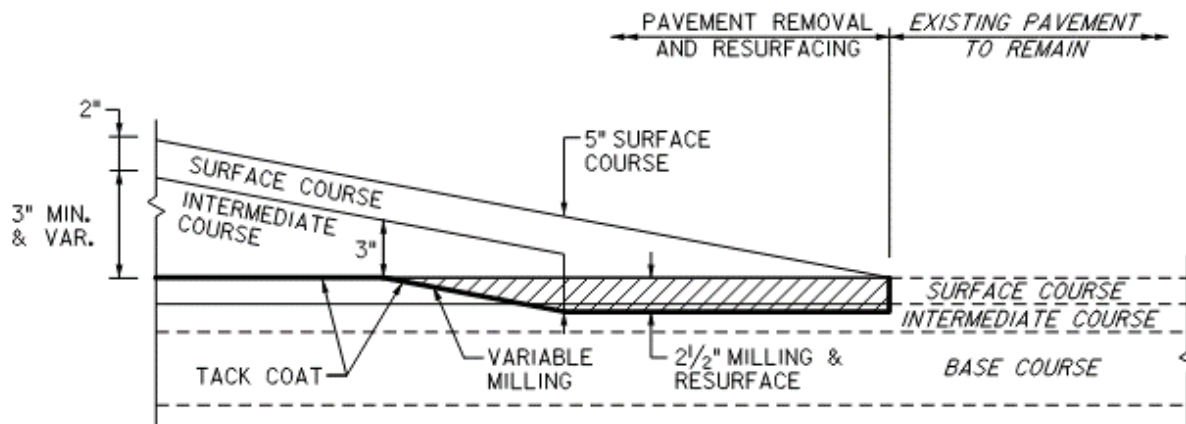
Parkway Pavement Section (Mainline, Ramps, Shoulders, U-Turn & Z-Turn)
